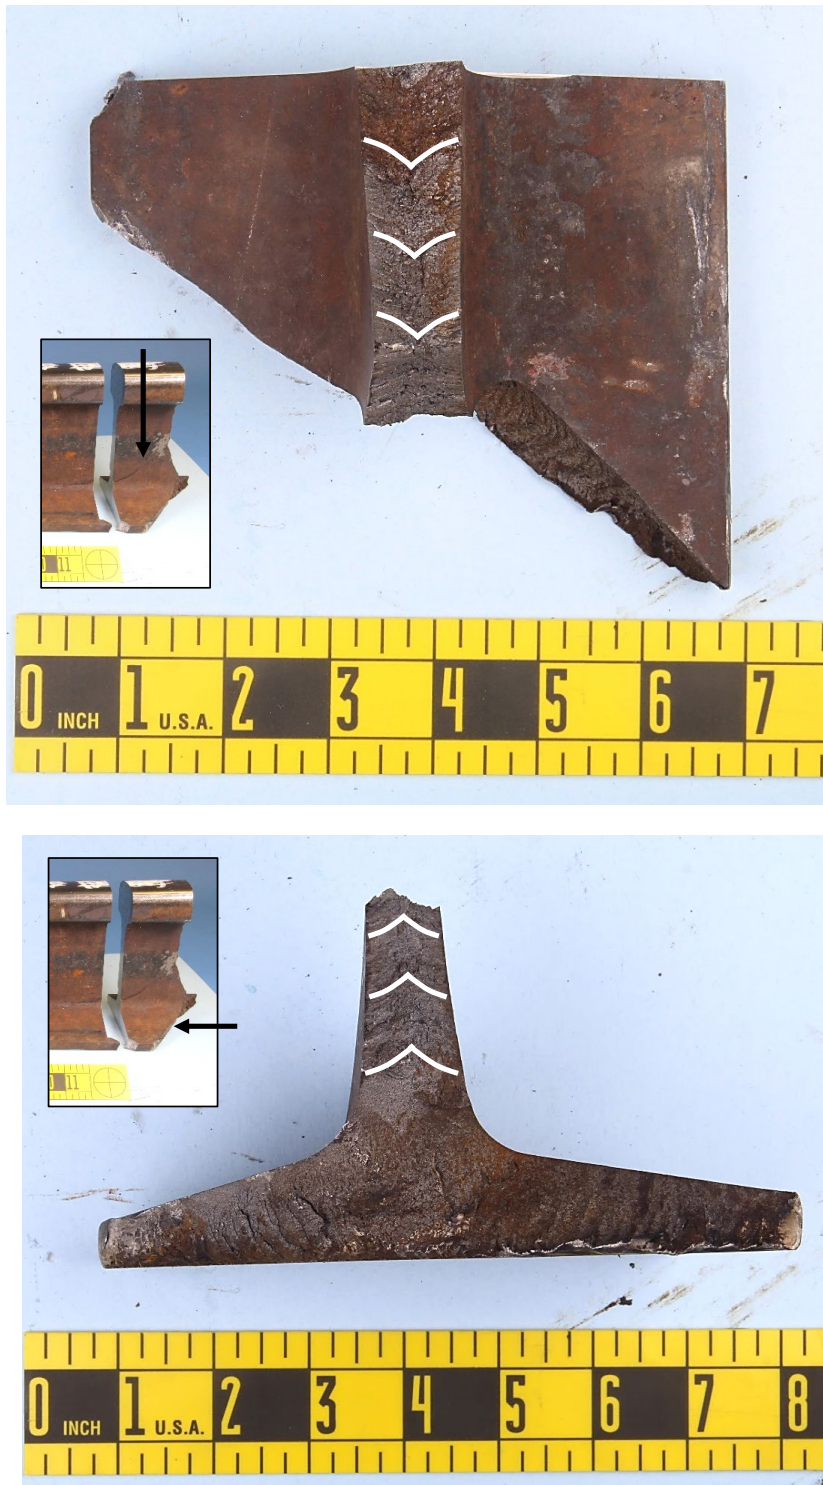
Close-up photos of the fracture surfaces on the base portion of piece 4E. Chevron marks on the longitudinal web fracture (white lines, top image) pointed back towards the transverse web fracture surface, while chevrons marks on the transverse web fracture surface (white line, bottom image) pointed in the direction of the rail head. The inset photos show the direction of the view in each close-up photo, indicated by the black arrows.
